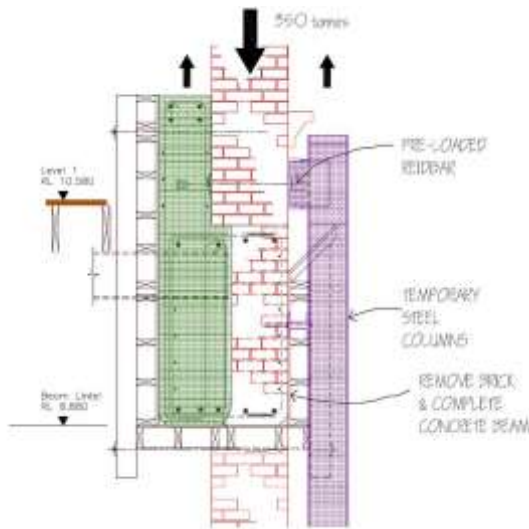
Schematic showing the partly constructed lintel beam in the rear wall of the CPO.
